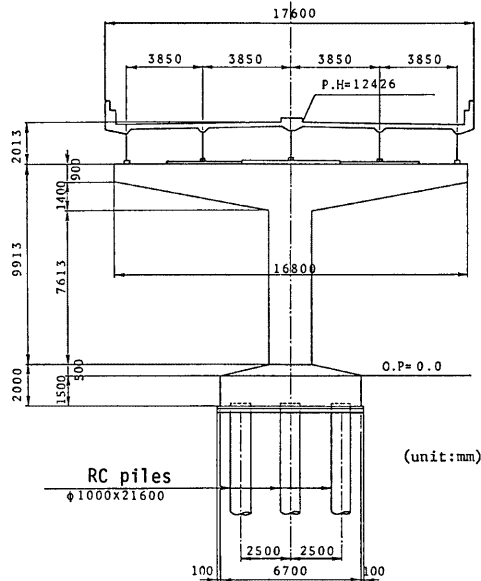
Prototype pier. (Hanshin Expressway, Sumiyoshi Section 2, Pier No. 4)
